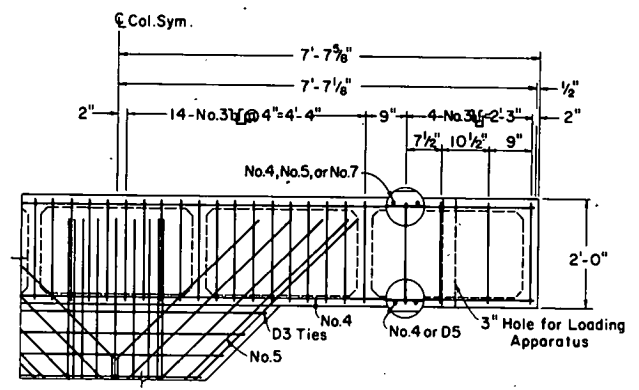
Bent Cap Reinforcement for Specimen SF-5
